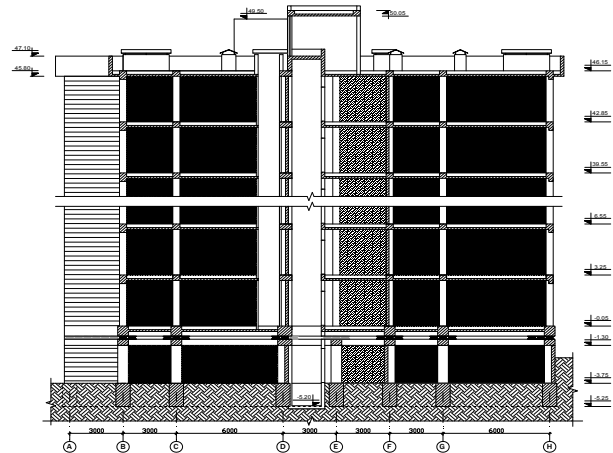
Vertical elevation of the 15-story base isolated apartment building “Avan” in transverse directions along the axis “5”
